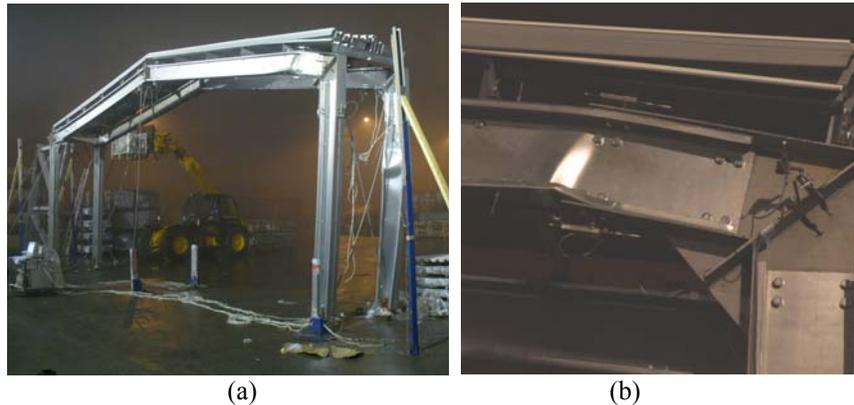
C2 frame: global view (a) and local buckling of the right beam connection (b).
